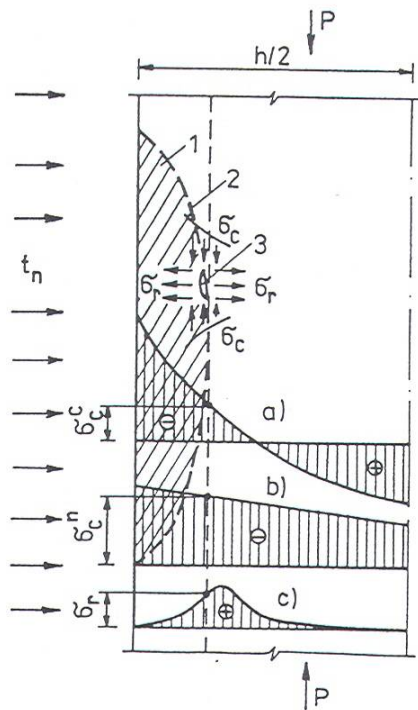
Development of an unstable crack leading to fire spalling, reproduced from Zhukov (1976). Notation: a) internal stresses, b) external load stresses, c) steam generated stresses, 1- piece of spalled concrete, 2 - trajectory of the crack development, 3 - crack.
